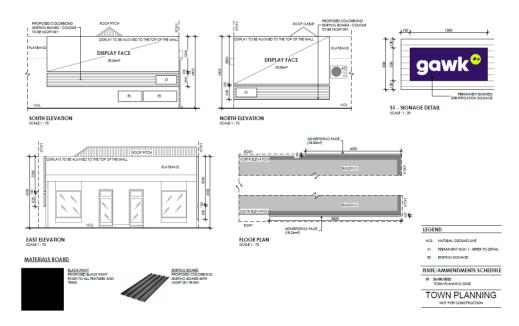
Proposed signage dimensions and elevations (Gawk, 2022)
